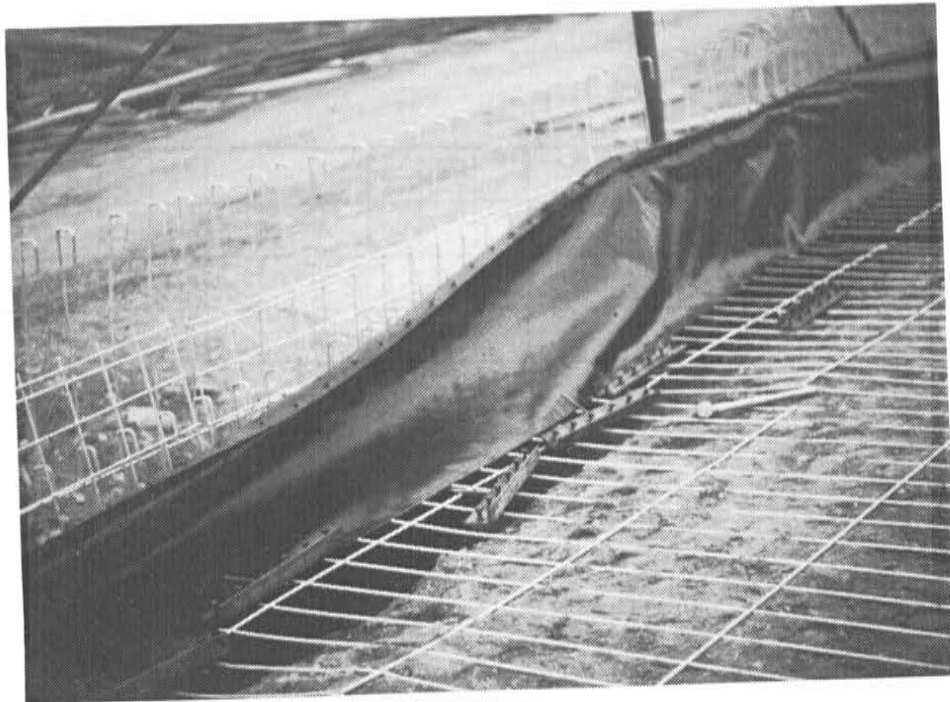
Tying of the Woven Geotextile Fabric Screen to the Reinforcements
